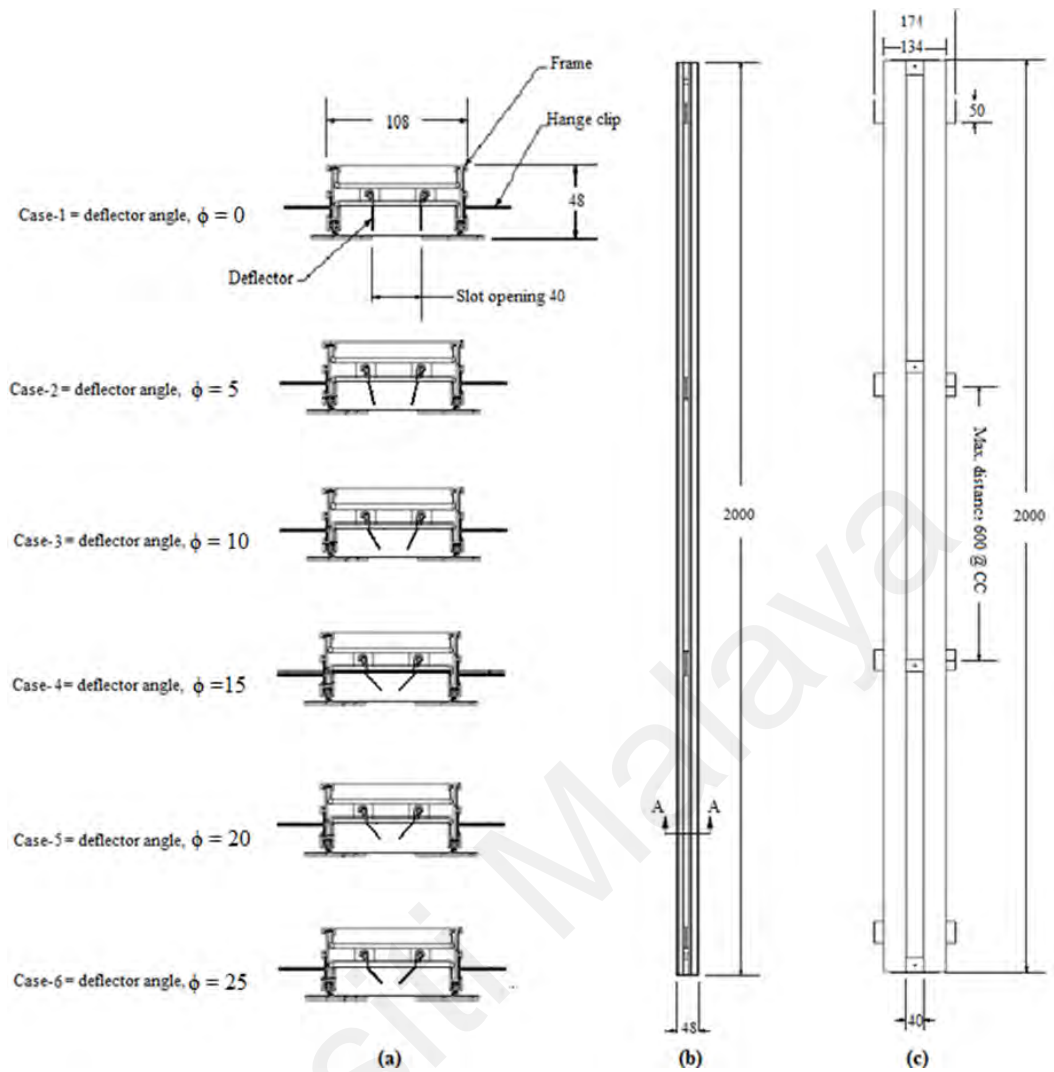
Geometrical model of the HCLSD (a) section A-A with different deflector angles, (b) side view and (c) front view (all measurements are in mm)
